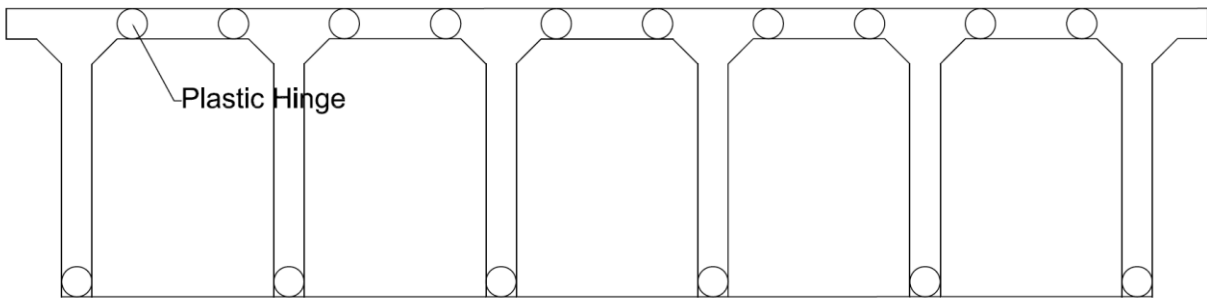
Second Collapse Mechanism: Plastic Hinges Formed at Base of Columns and End of Beams
